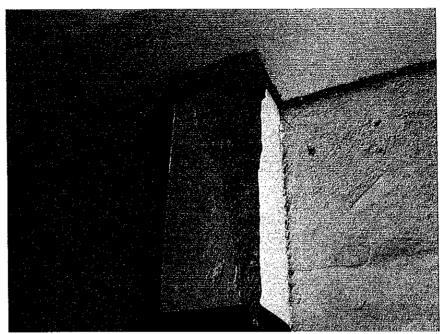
Spalled pilaster near A/30 in elevator loby of level 3. There is no structural issue here; the pilaster may be patched and painted to match for appearance.
